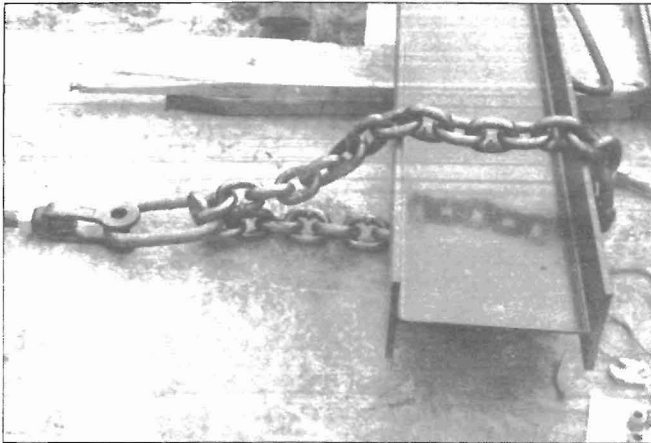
Assembly mock-up showing beam, chain, clevis, and attachment to tie-rod on platform.
